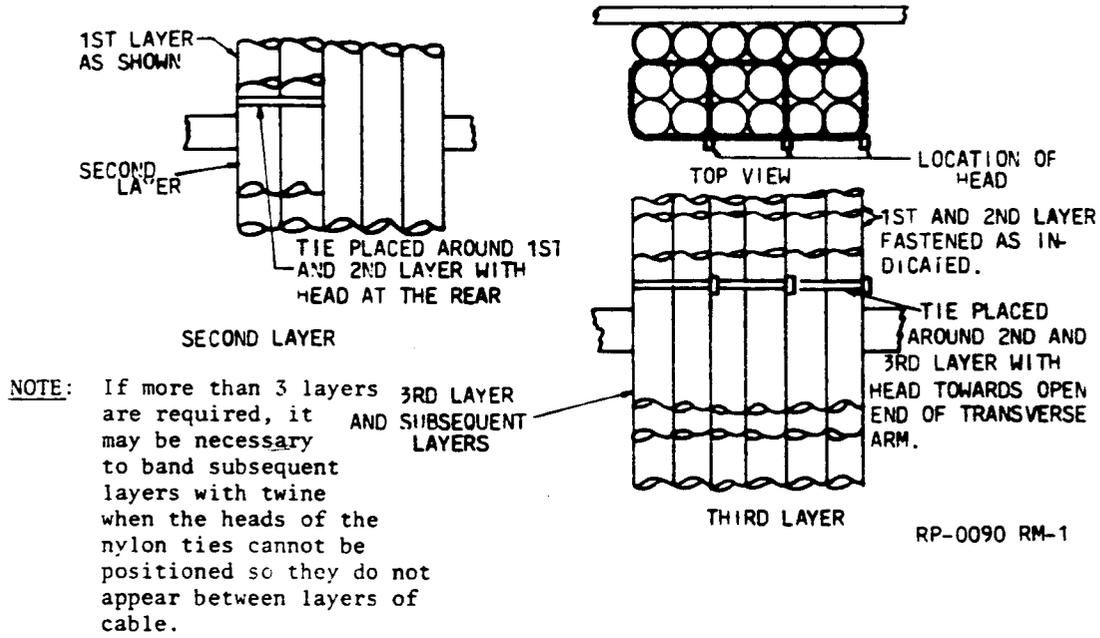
SECURING SECOND AND SUBSEQUENT LAYERS OF CABLE ON VERTICAL SIDE OF DISTRIBUTING FRAMES (PAR. 5.31)
